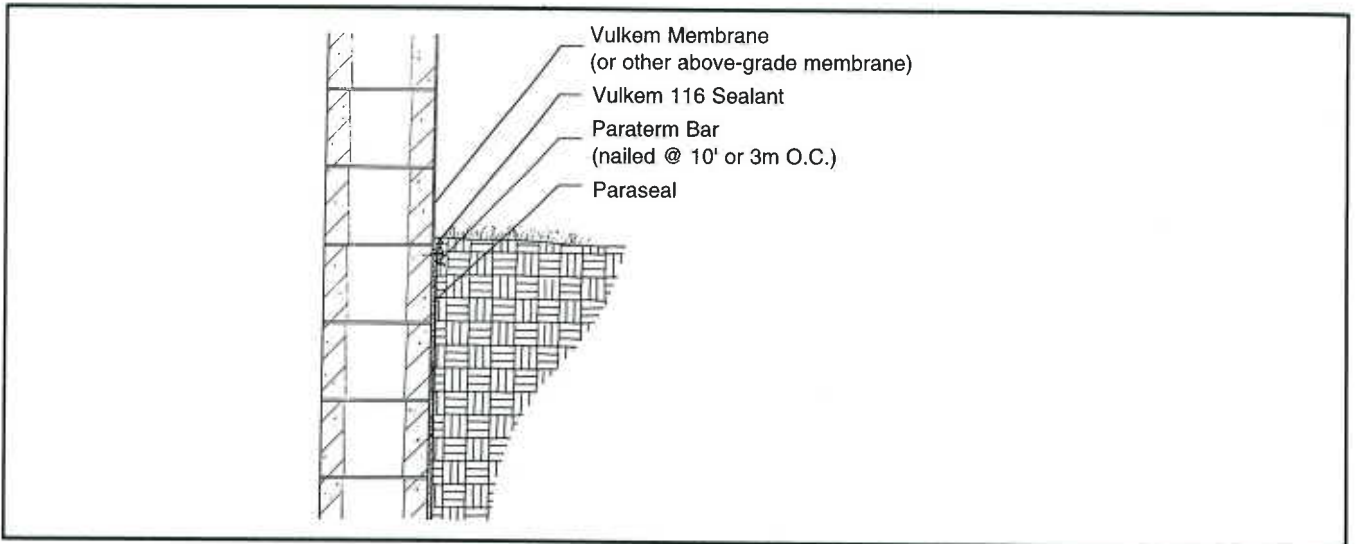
Tie-In of Paraseal to Other Existing Waterproofing.
